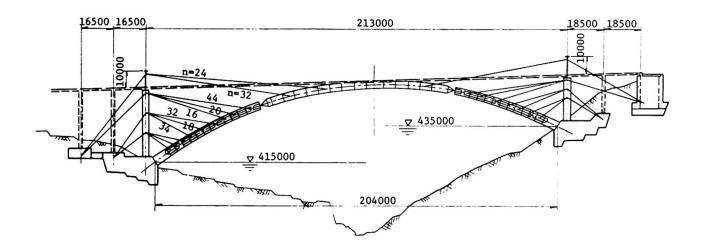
Erection of concrete arch bridge with the help of steel frames
